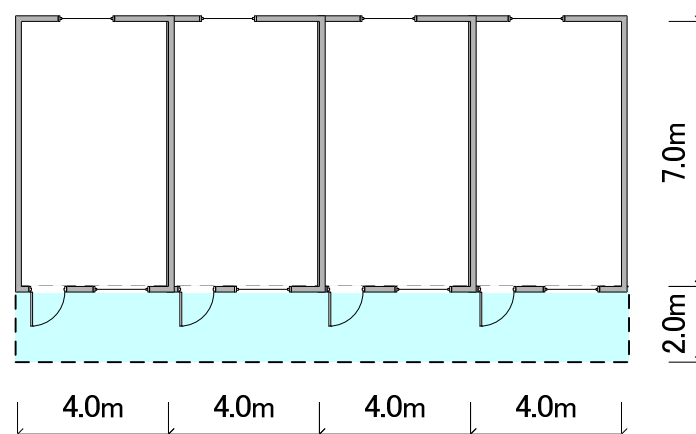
Health Centre: Four Room Standard Plan
